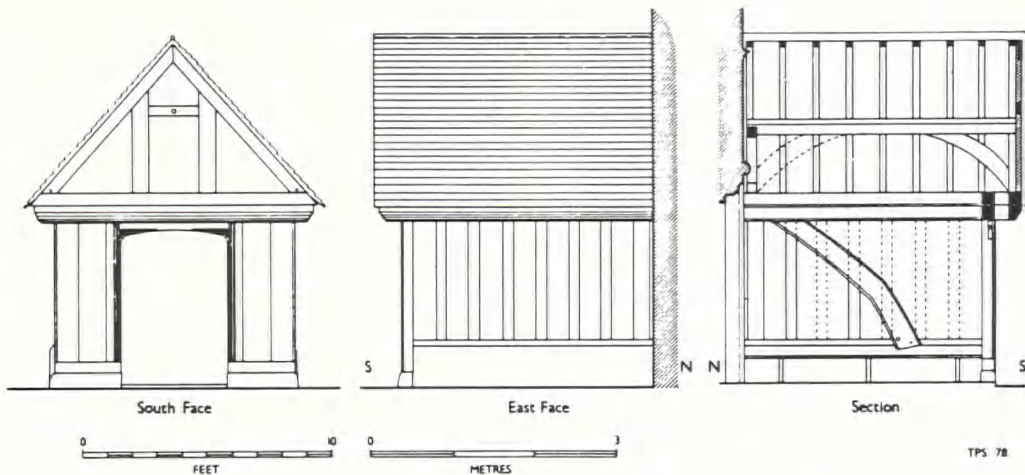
Flitwick, church of St Peter and St Paul; South Porch Elevations and Section
